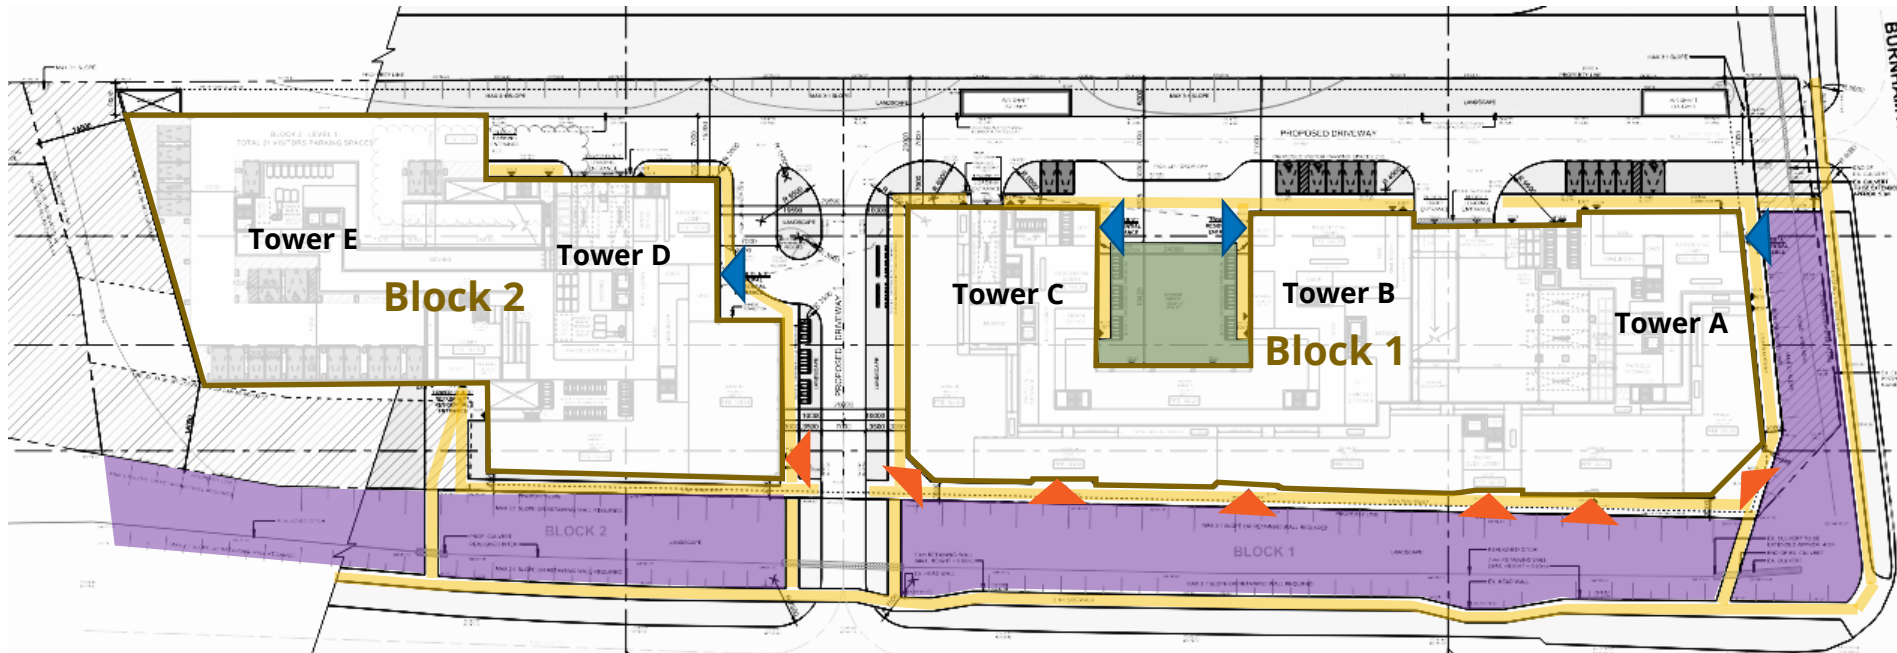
L1 plan of the proposed project showing walkways, entrances, parking, and amenity areas
